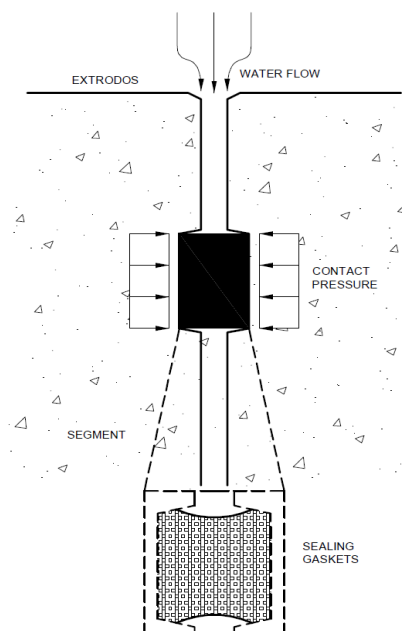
SEALING MECHANISM OF GASKETED JOINTS IN SEGMENTAL LINING
